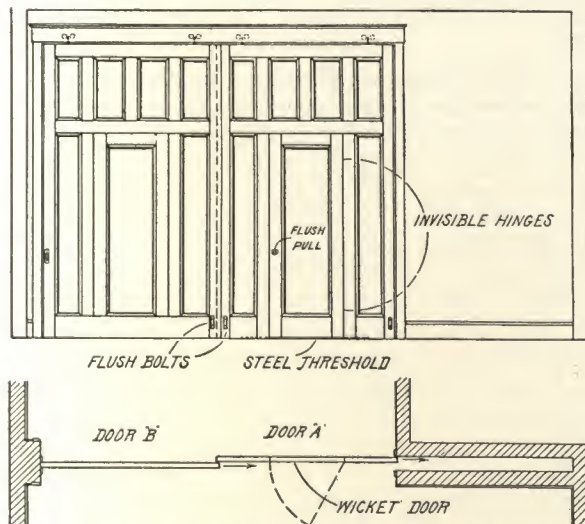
Plan and Elevation of a Parallel Partition with Wicket Door
